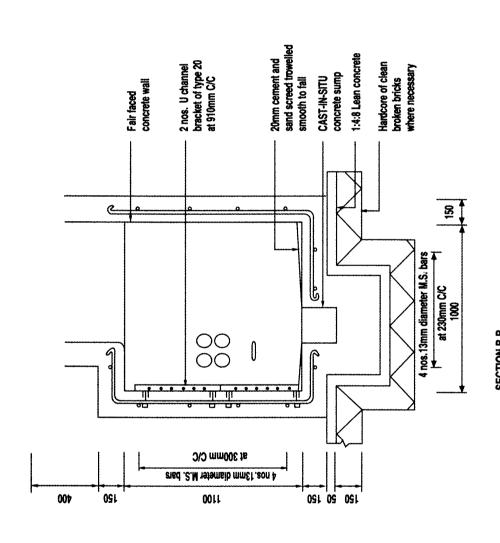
MANHOLE DRAWINGS - TYPE MX2
